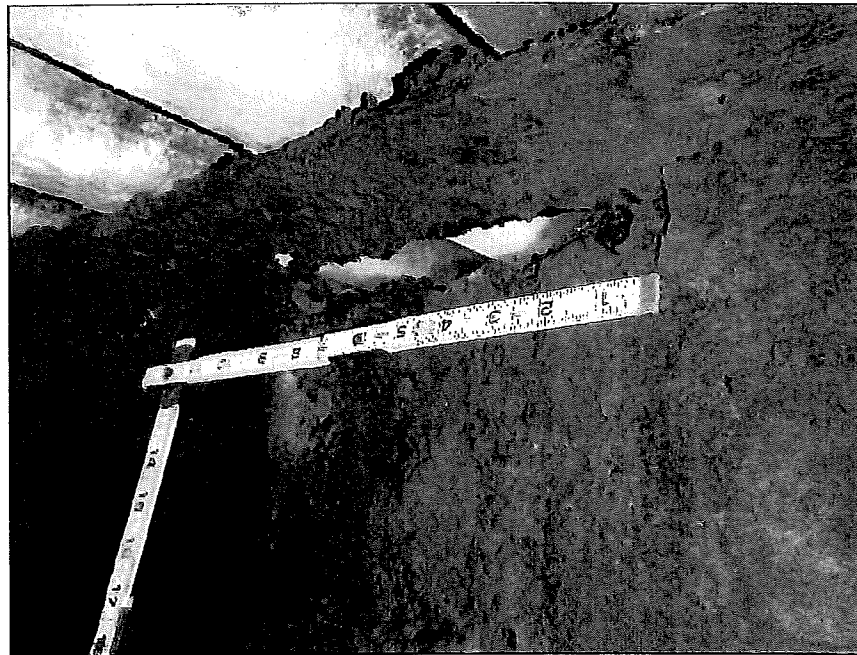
10" L x 1" H area of 100% Section Loss in Web of Beam 2 adjacent to West Abutment
